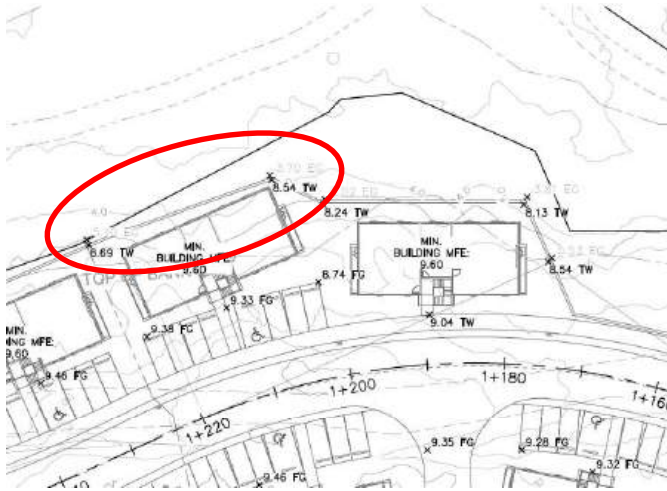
Civil drawing C03. Retaining walls and fill (18 – 23 feet in height to reach 10.7m tsunami flood plain) at edge of park, within root zone of trees?
